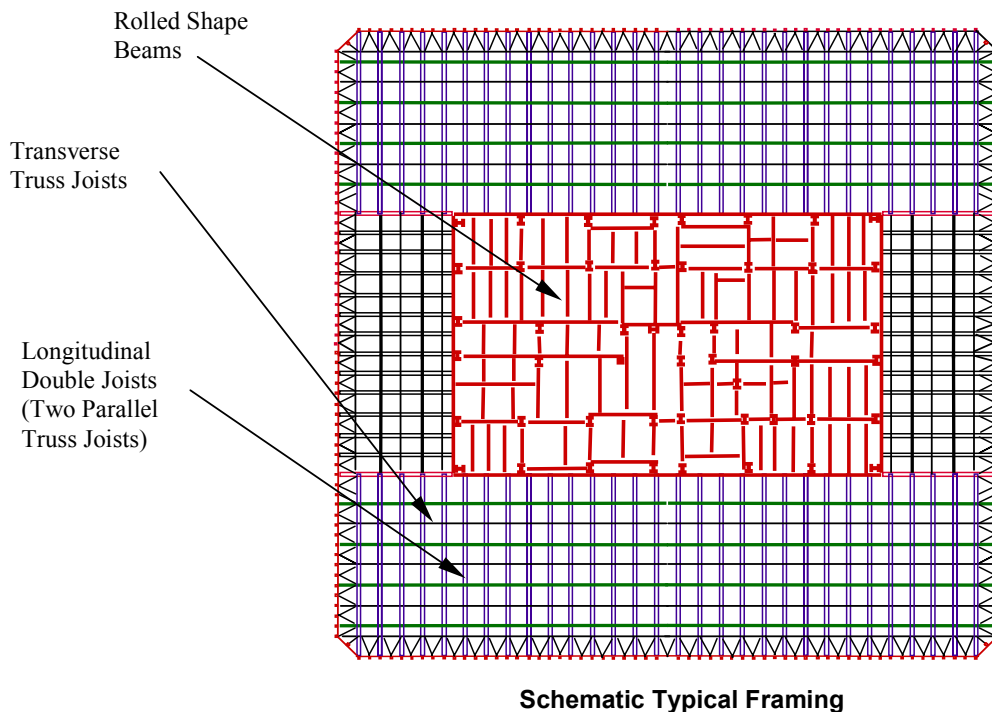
Typical Framing Plan and Details of Longitudinal and Transverse Trusses
